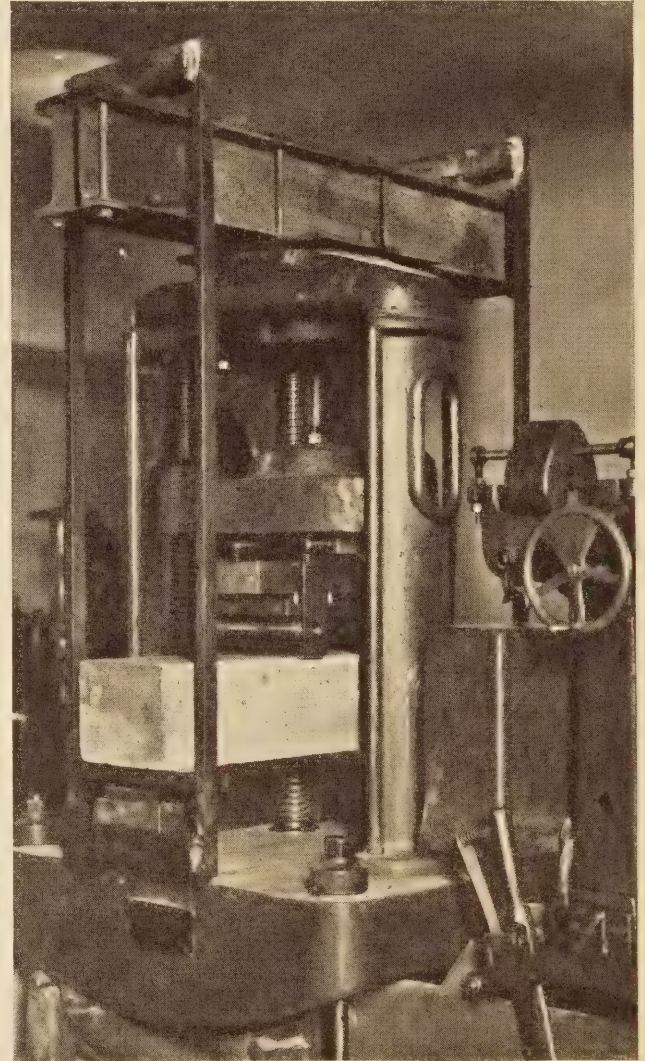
GENERAL VIEW OF APPARATUS FOR FLEXURE TESTS OF CONCRETE BEAMS, SHOWING SPECIMEN IN PLACE, READY TO BE TESTED
